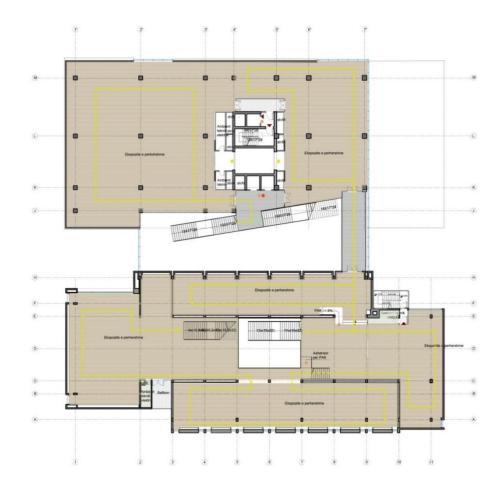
1064. The proposed plan for the First Floor of the New Museum.
